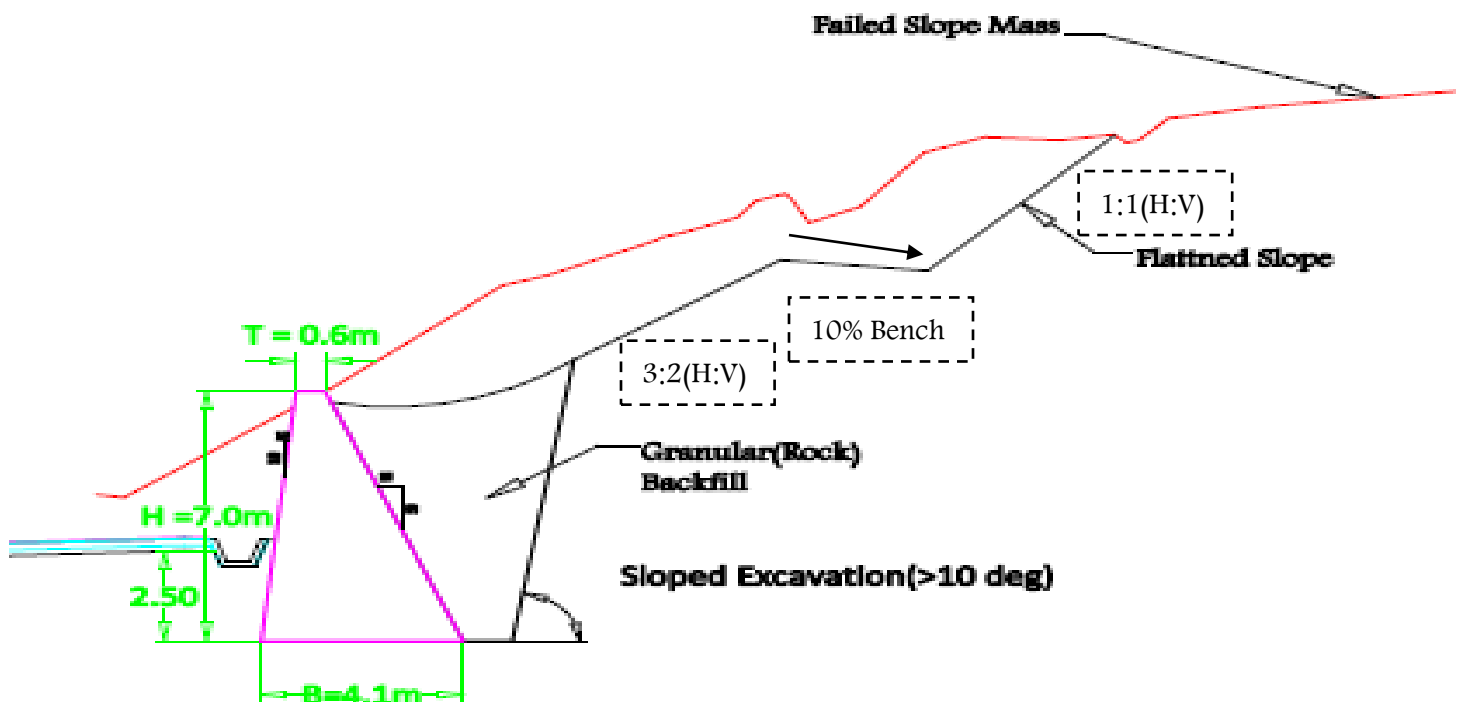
Tentative dimensions of retaining wall and failed slope to be flattened
